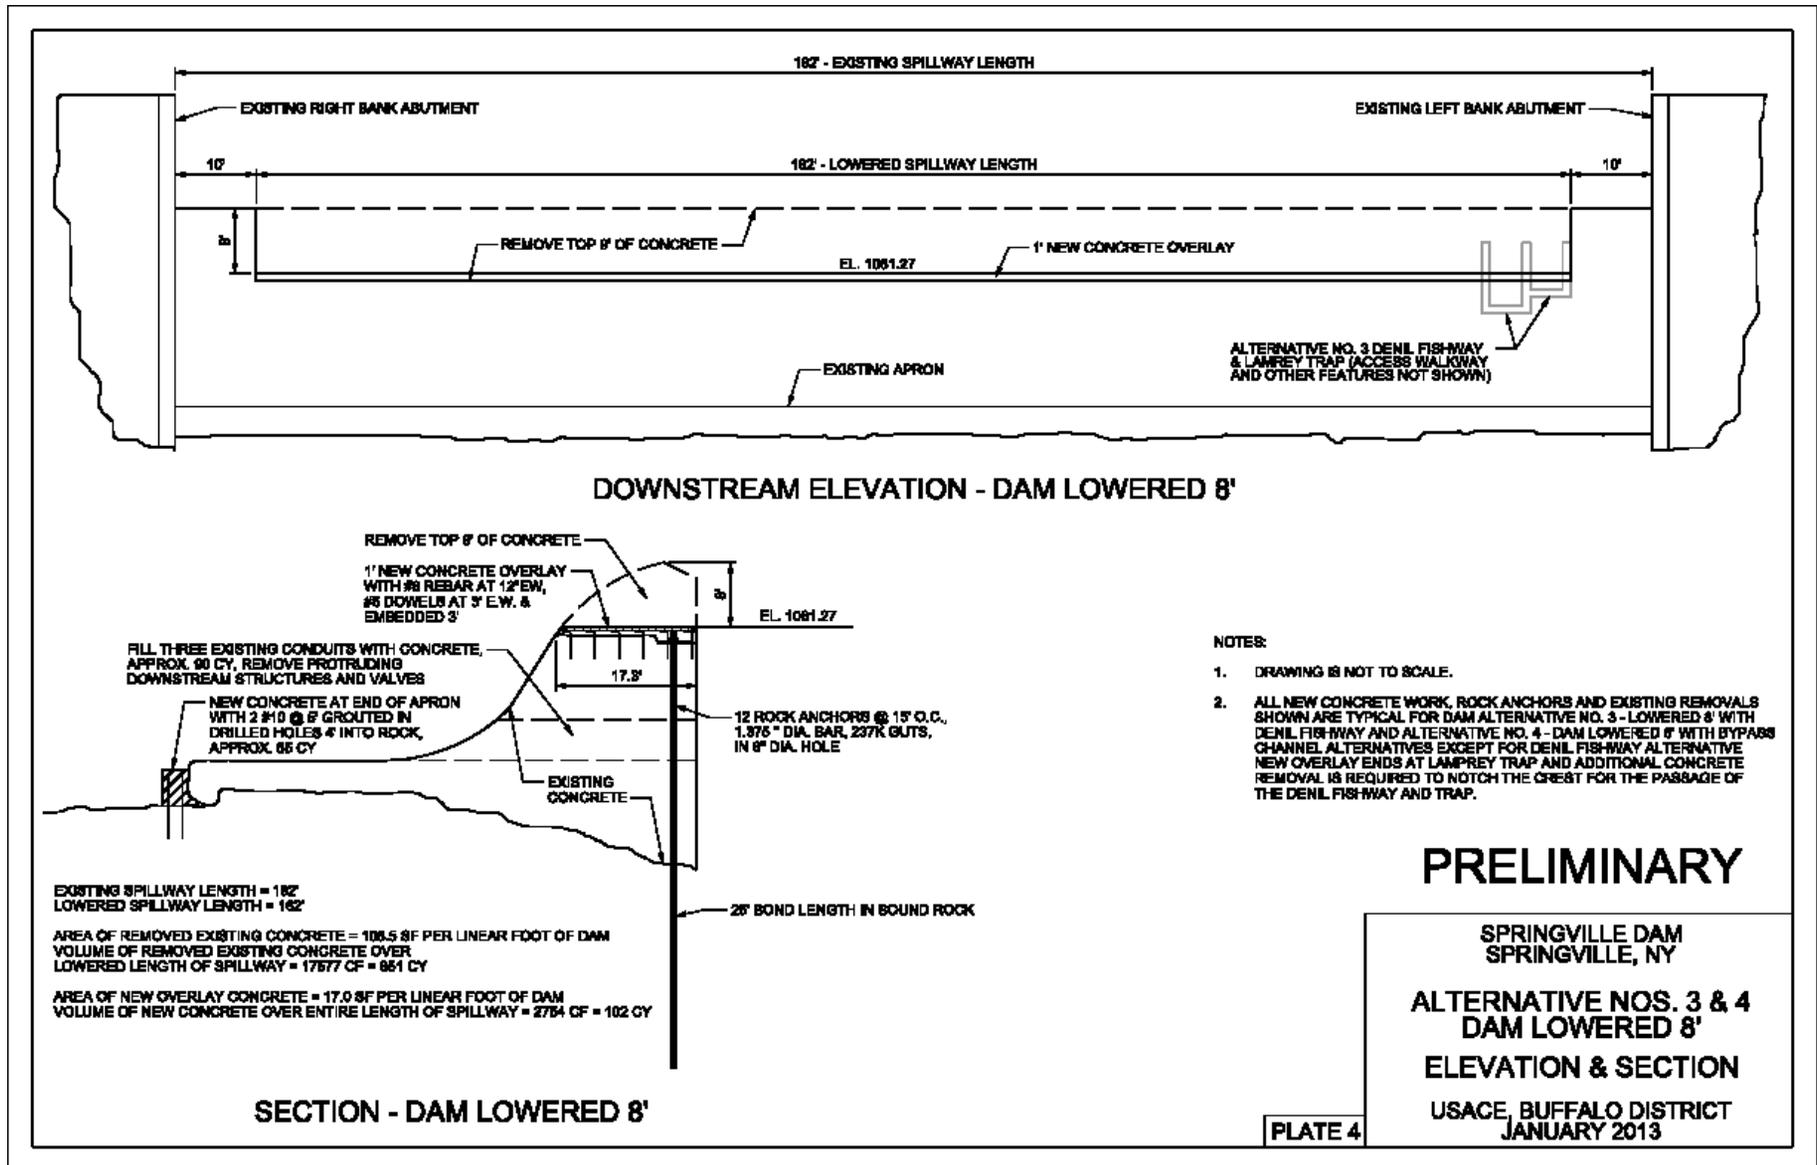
Elevation and cross section drawings for Alternatives #3 and #4 – Dam lowered eight feet.
